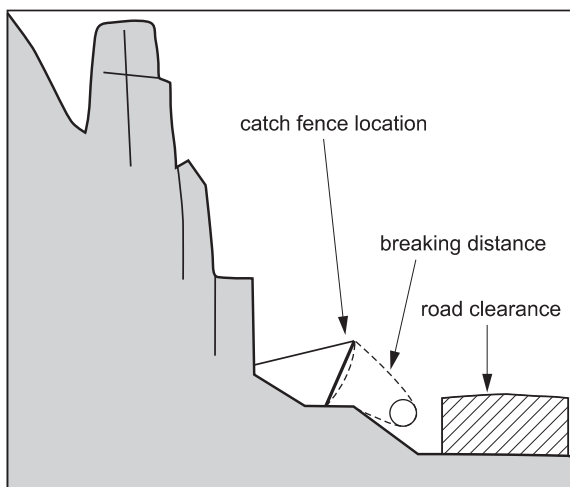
Typical cross-section with catch fence location between rock cliff and road
